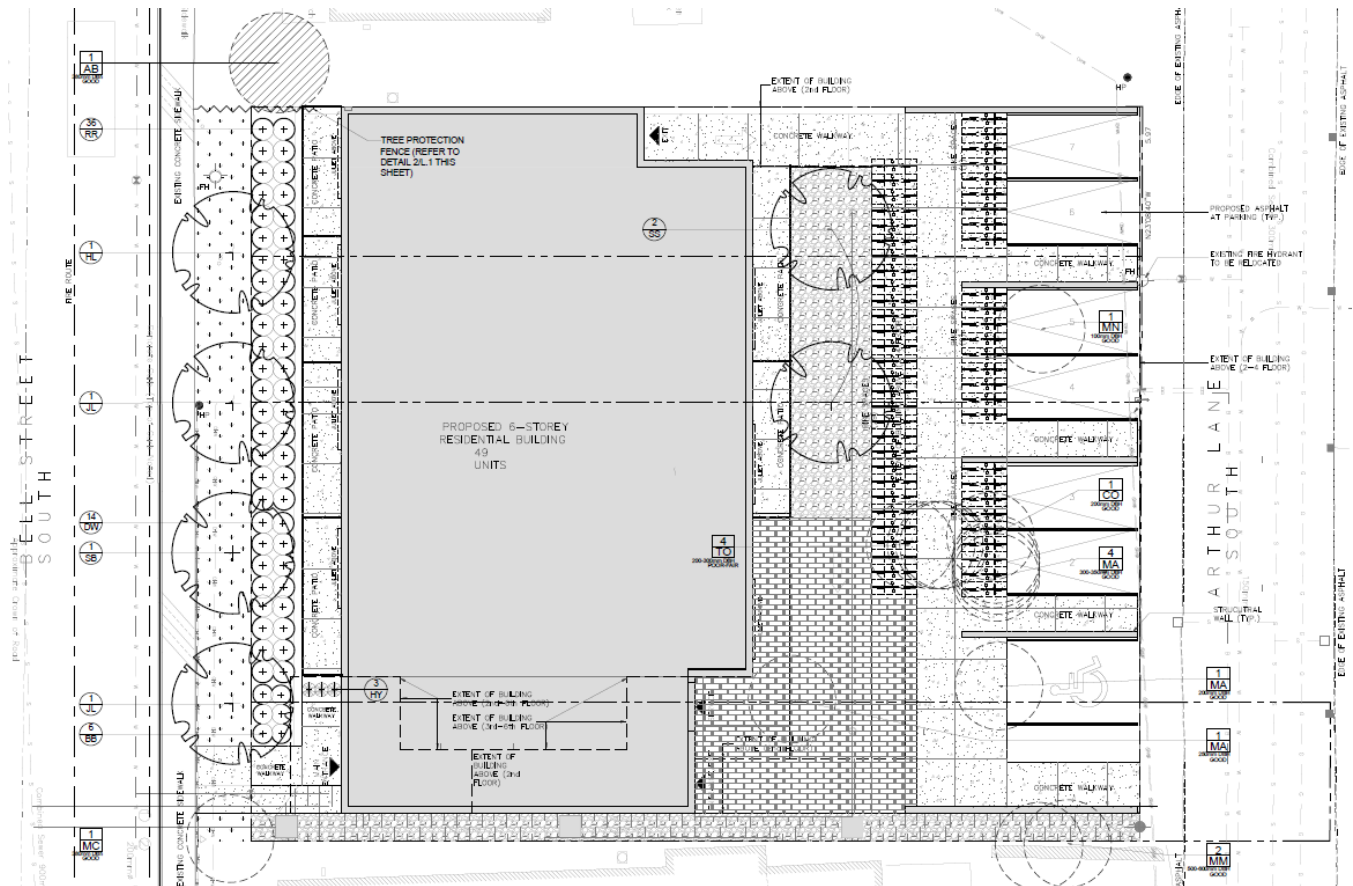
Extract from Landscape Plan, Showing Front Yard and Courtyard Landscaping
